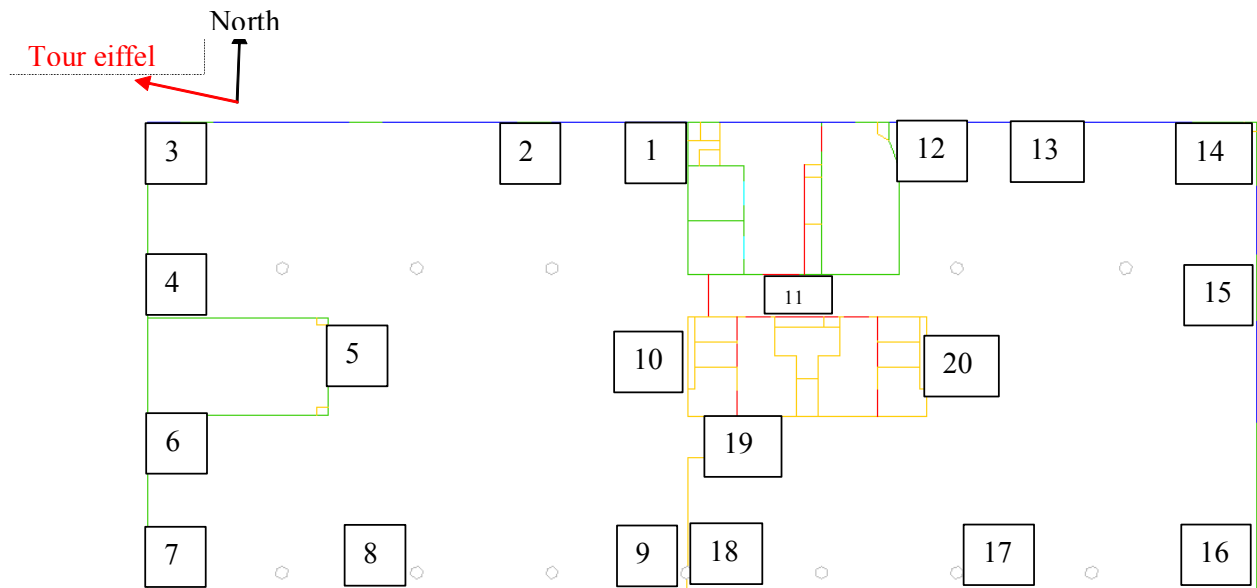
Typical measurement locations at 6th and 7th floor in Copernic building
